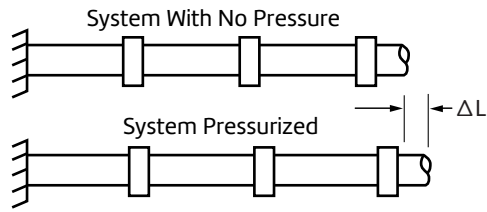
The coupling joints have been installed butted or partially open. When pressurized the pipe ends in the coupling joints will separate to the maximum amount permitted by the coupling design.
